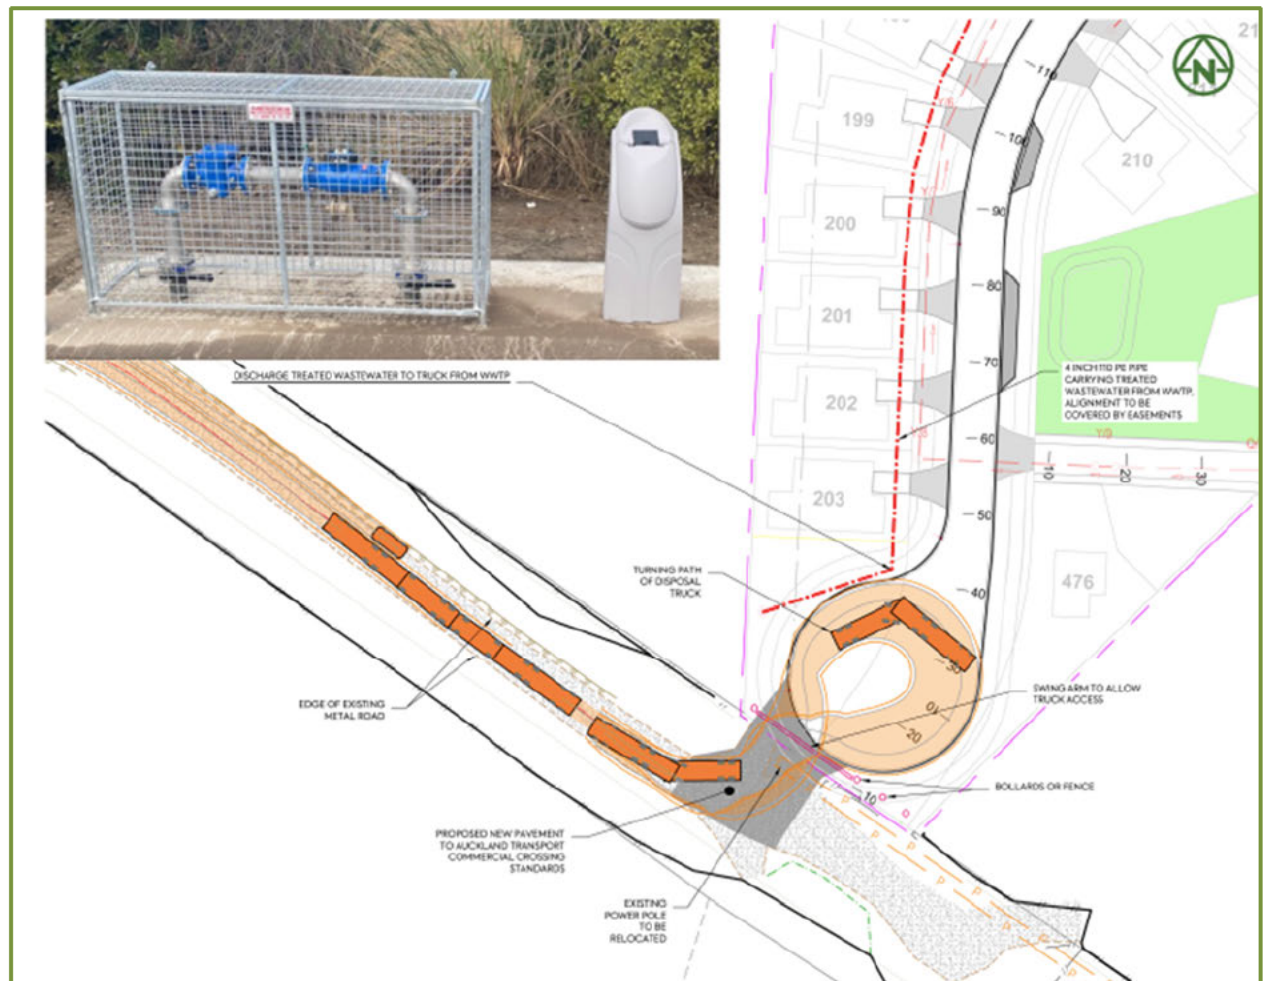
Turning head for trucks in Road 1 cul-de-sac.
